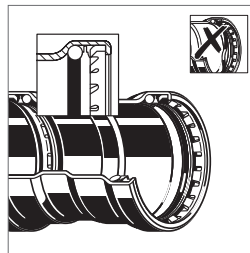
Ensure the proper seat of sealing element, separator ring and cutting ring.
